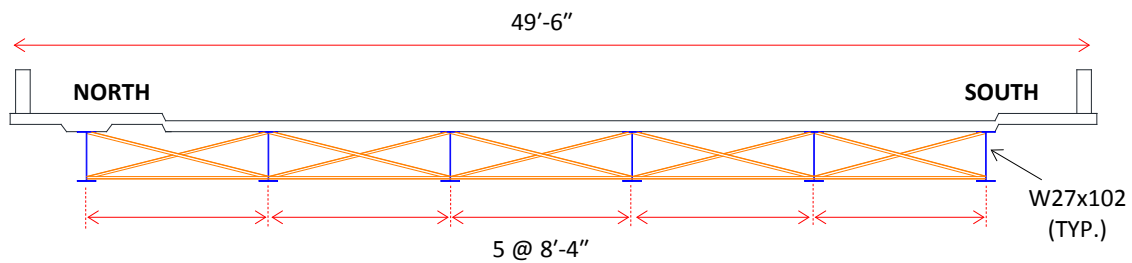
Dimensioned cross-section view of the TX-71E Bridge.
